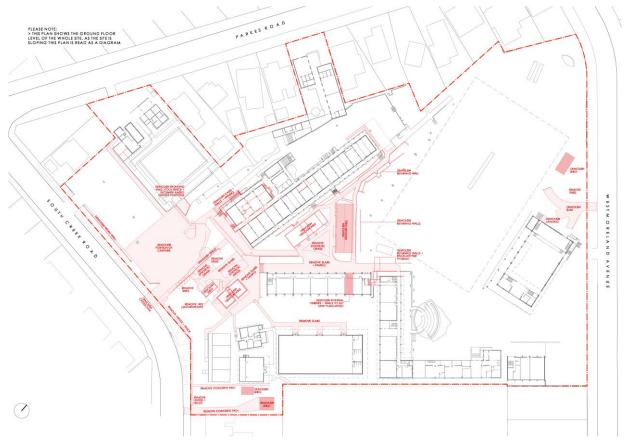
Excerpt from the Demolition Plan issue 060819. (Neeson Murcutt Architects 6 August 2019).
